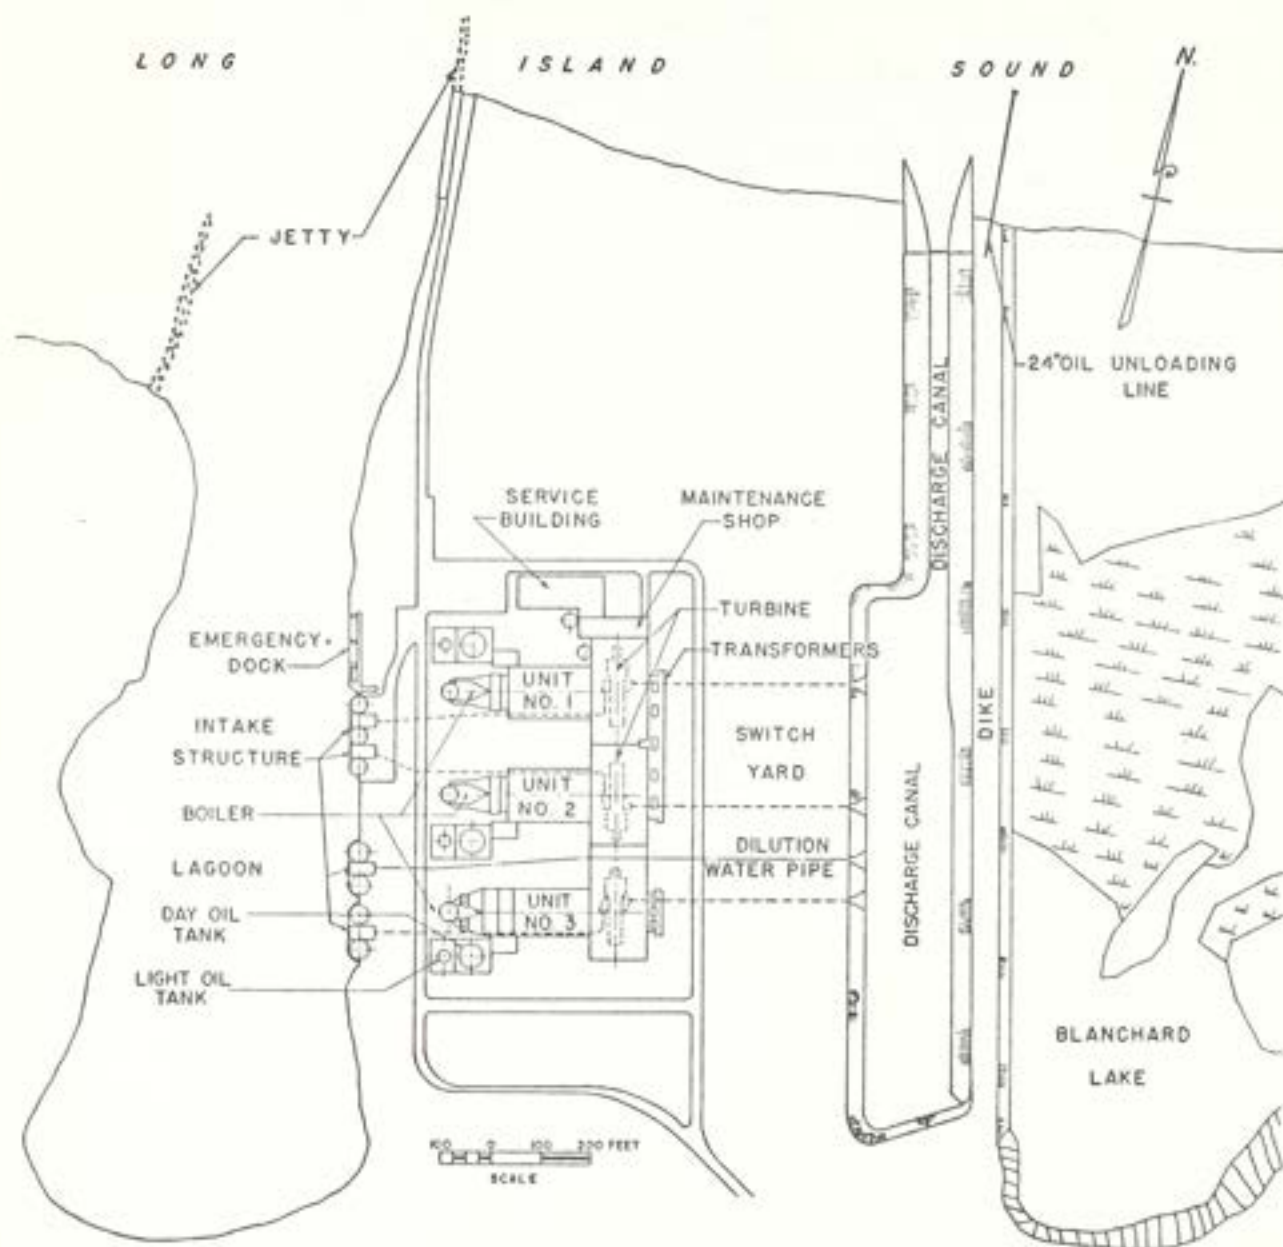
PROJECT LAYOUT, NORTHPORT POWER PLANT
